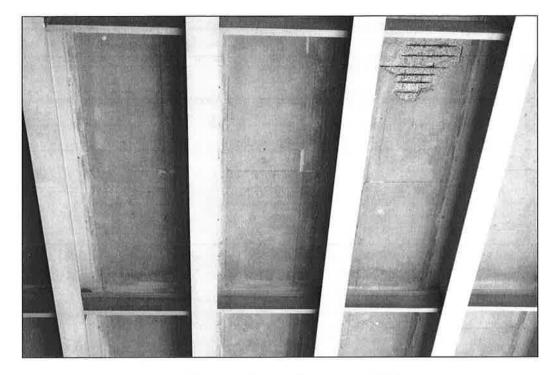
Typical Condition of Soffit (Bent 306-307) (fair condition – stained and unstained cracking, delaminations, spalls, patches, wet areas and light scaling)
